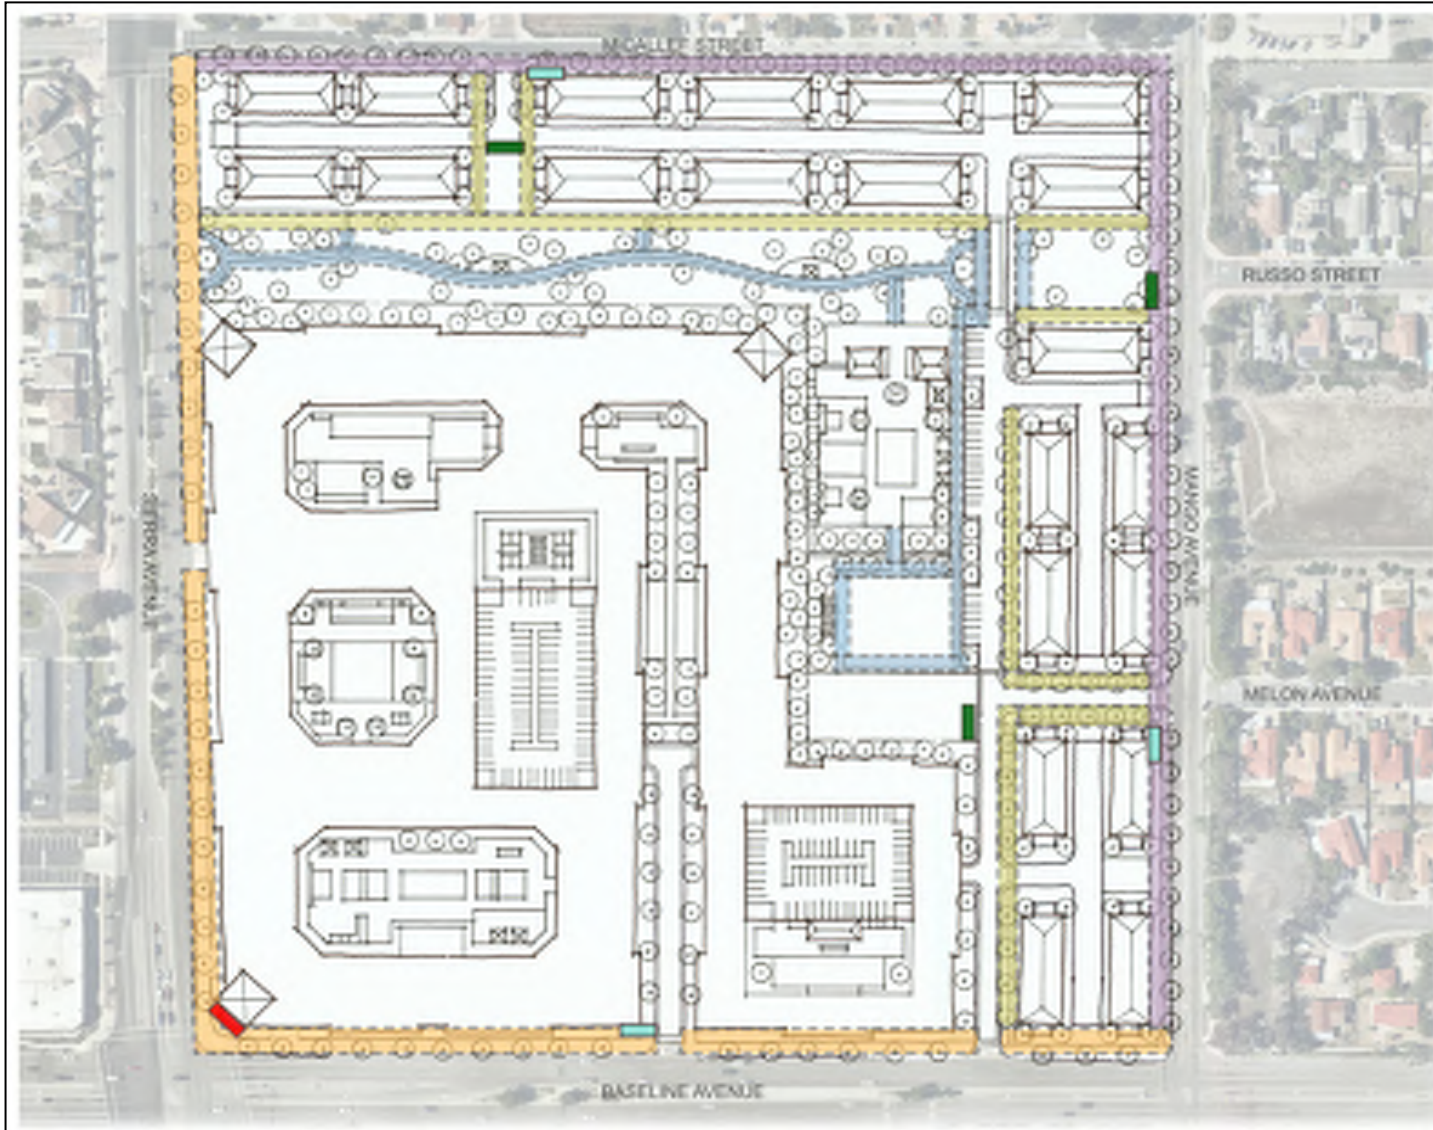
Monumentation and Walkway Hierarchy – Gateway South Sub-District
